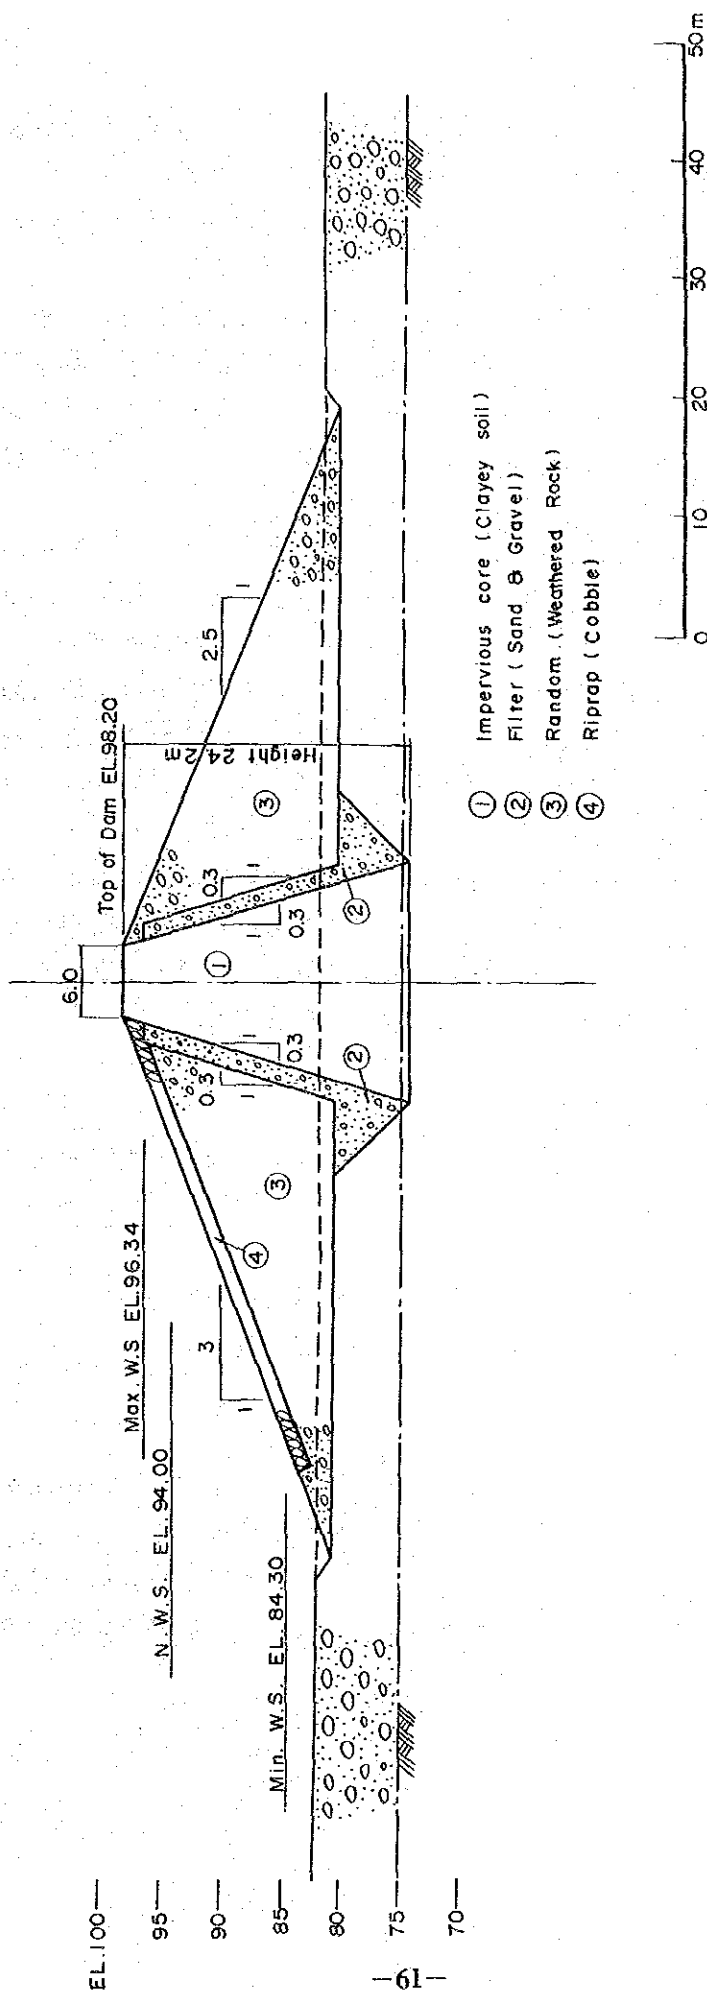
2. 4 TYPICAL SECTION OF BALNGES DAM
